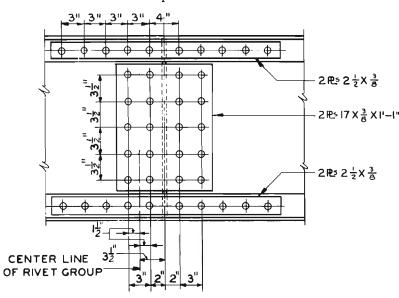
Riveted web splice of plate girder equivalent to 21-inch 63-pound rolled beam.
